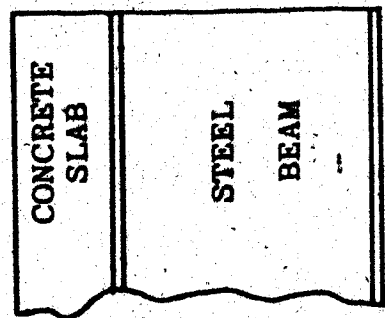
SECTION THROUGH TEST BEAM (HAMADA AND LONGWORTH)
